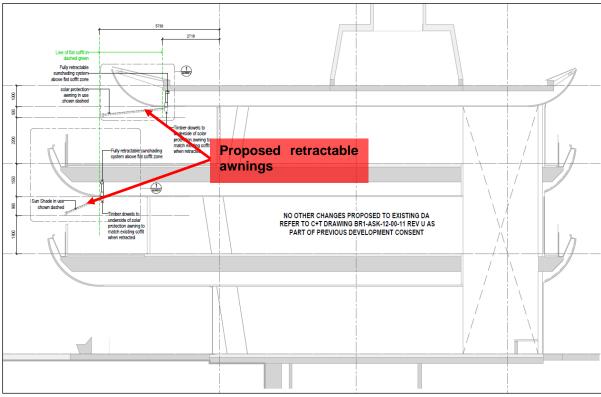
Proposed shade awnings when fully extended (Source: Applicant's EIS).
